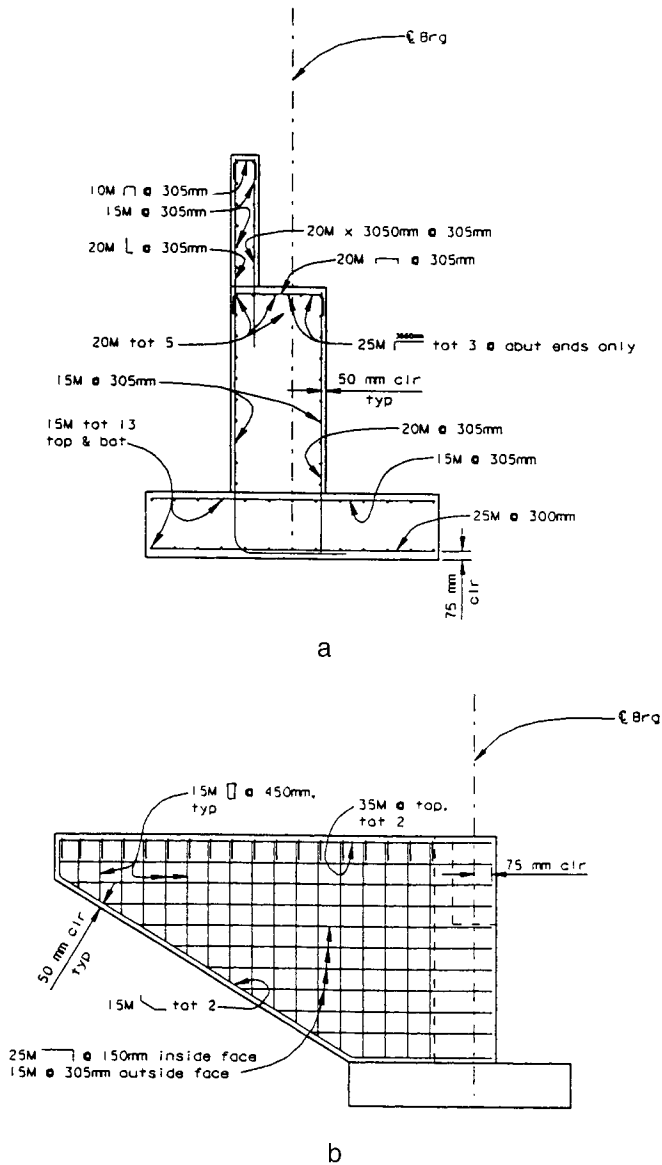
(a) Abutment typical section design (example). (b) Wingwall reinforcing (example).
